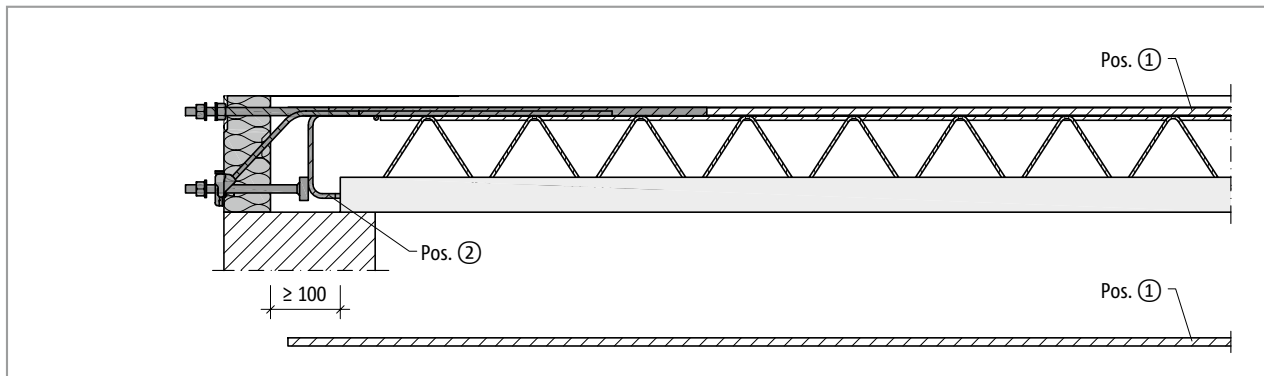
Schöck Isokorb® T type SK-M1: On-site reinforcement for semi-precast construction: Cross section
